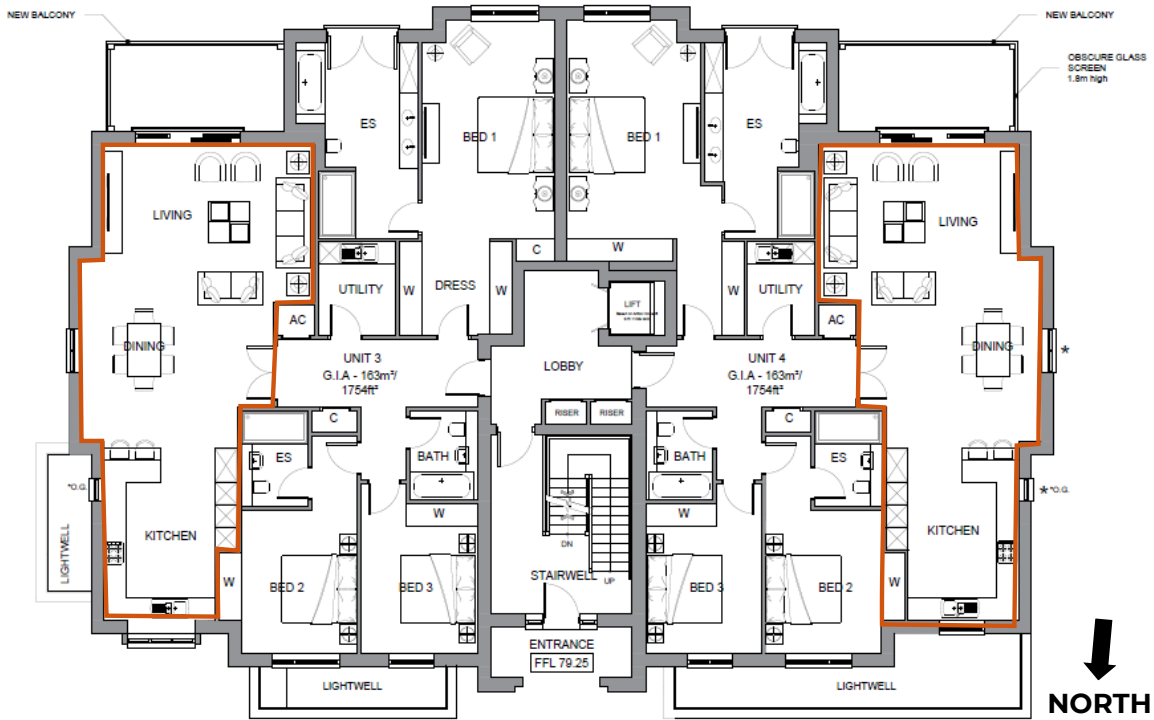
Ground Floor Plan by Ascot Design; rooms assessed (red)
